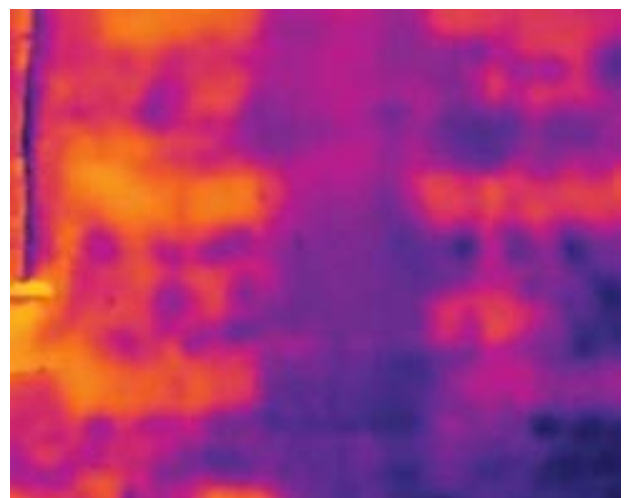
Wall texture - mixed structure consisting of masonry walls and reinforced concrete pillar
